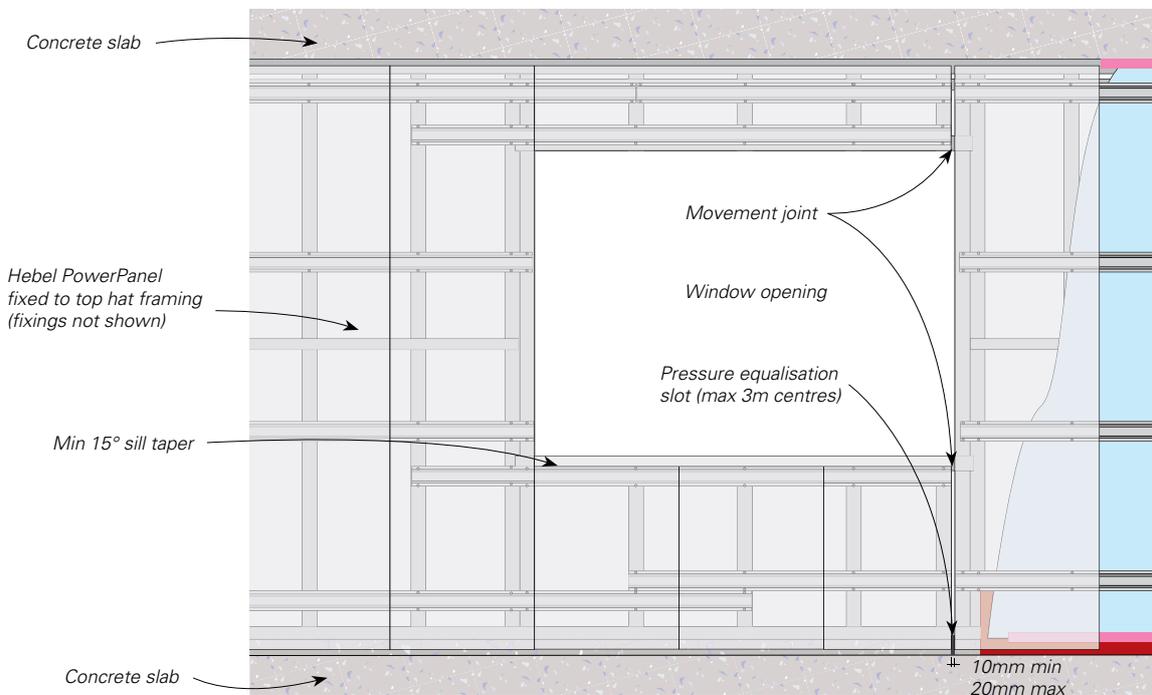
PowerPanel and joint details at windows (Visible slab edge detail shown)
